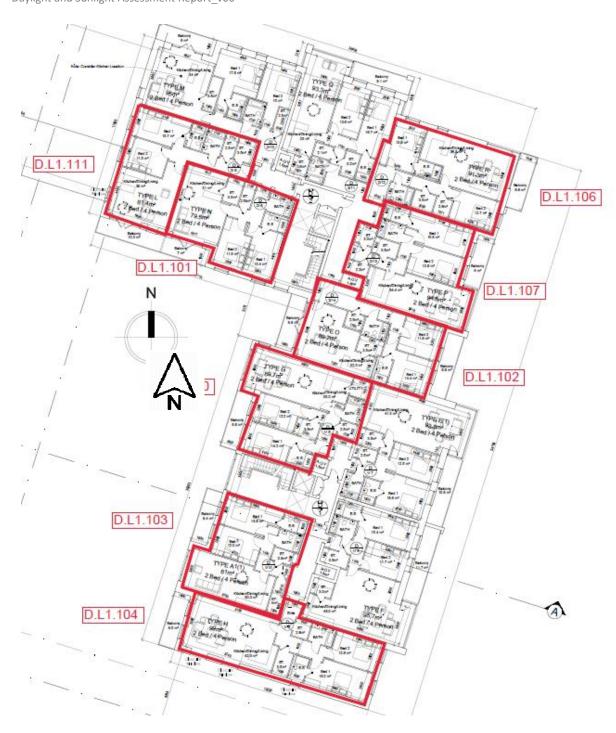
Floor Layout of the Proposed Scheme Block D – First Floor
